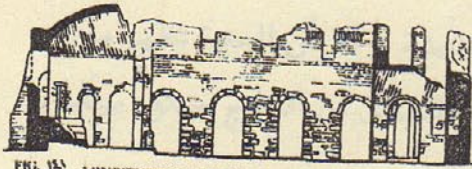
LONGITUDINAL SECTION LOOKING SOUTH ON LINE X X
